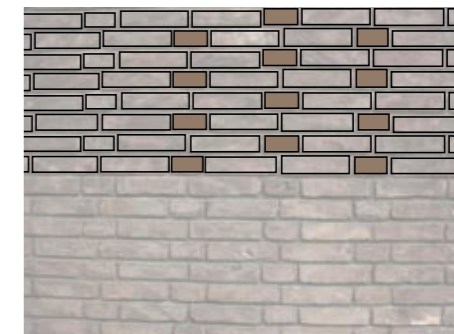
Monk bond on brick masonry (drawing by authors)
